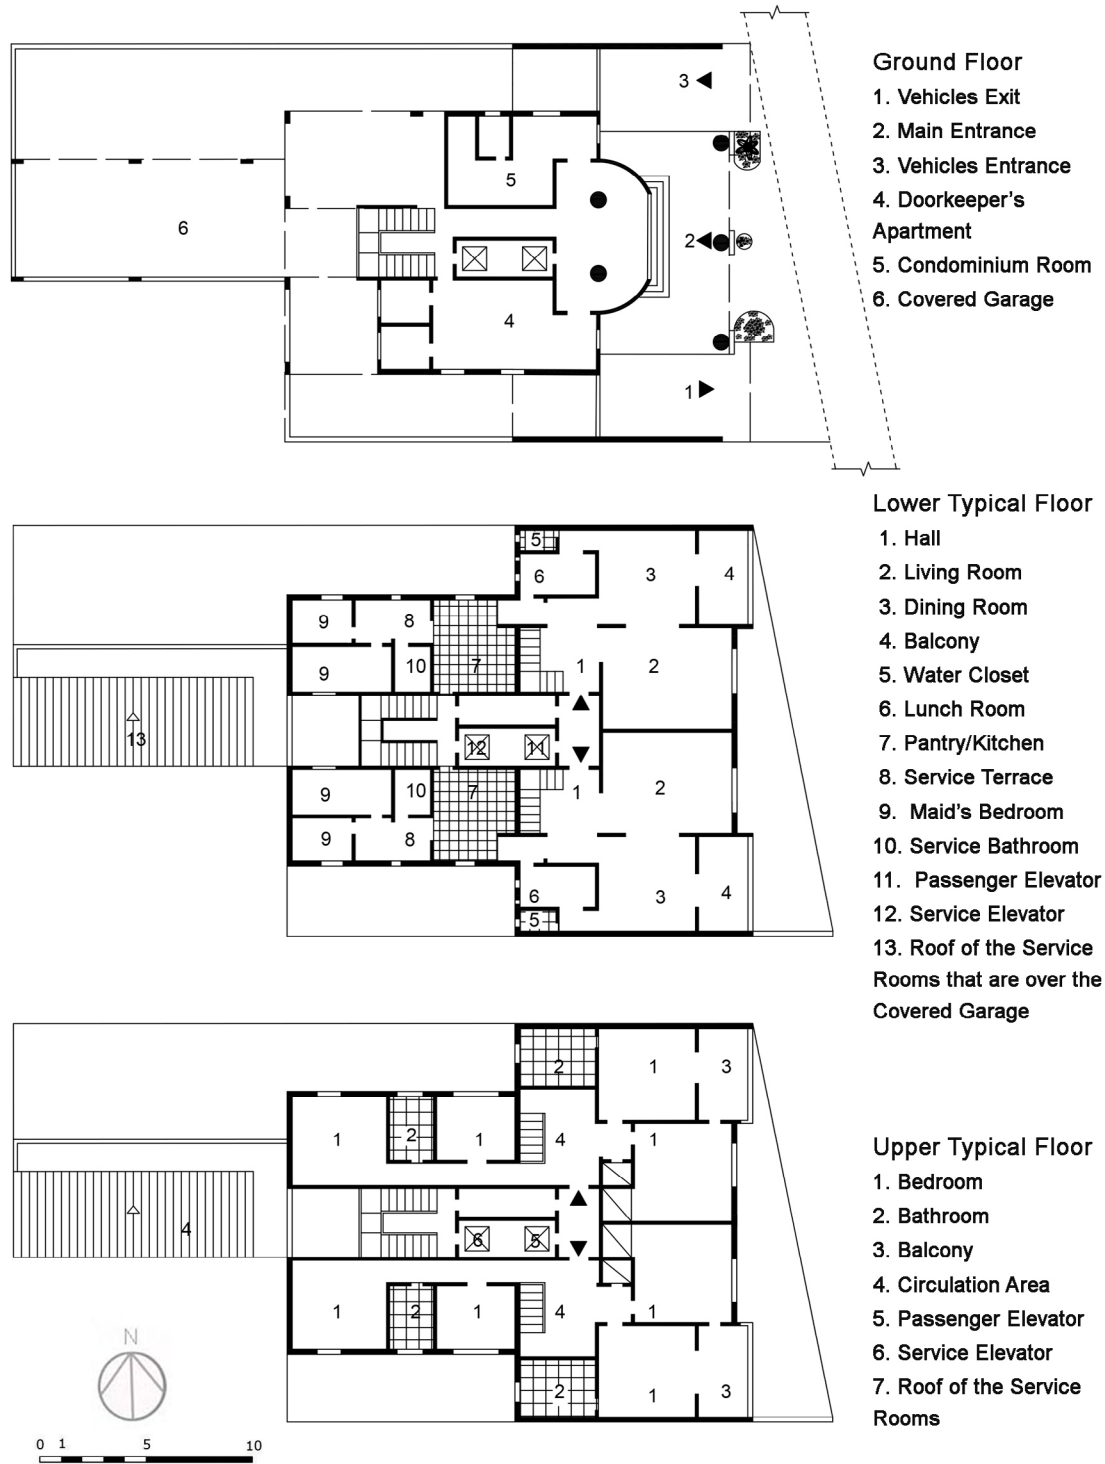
Floor plan of Florida building's ground, lower typical and upper typical floors
